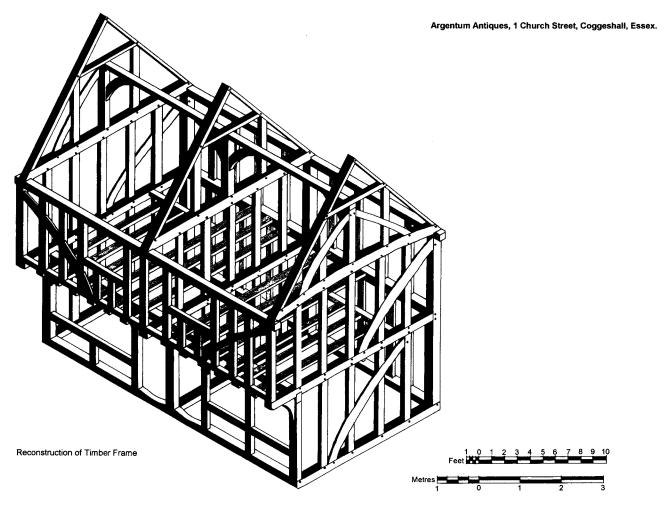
No. 1 Church Street, Coggeshall, reconstruction of the timber frame.
